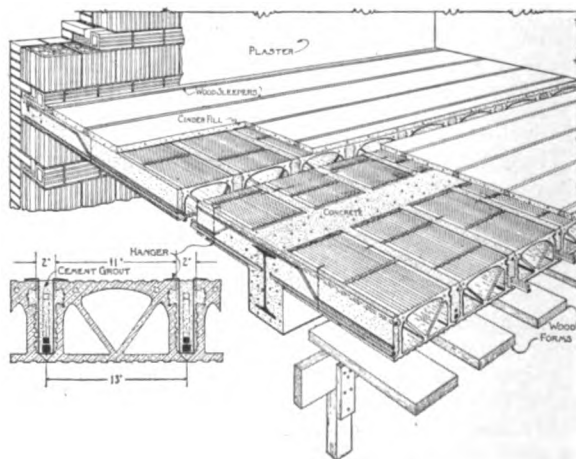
PERSPECTIVE VIEW OF TYPICAL "NATCOFLOOR"
